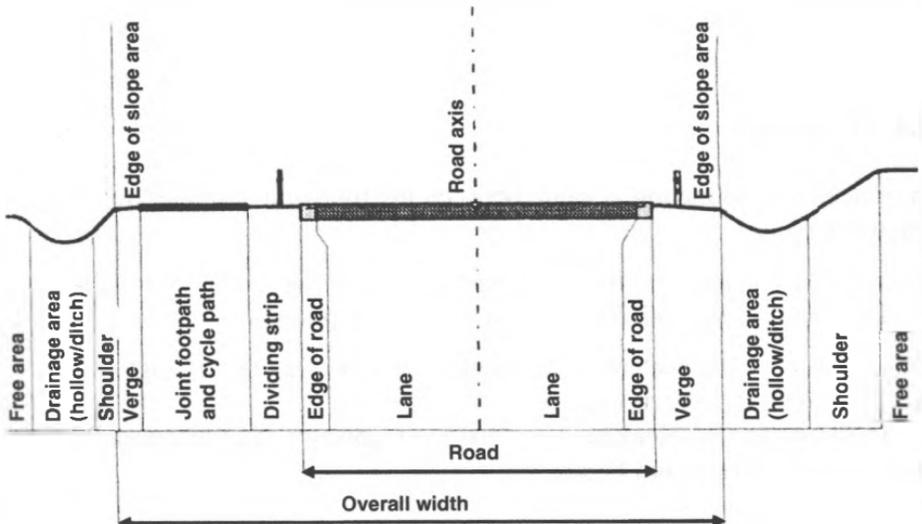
Cross section elements of an undivided highway with two lanes (rural road)
